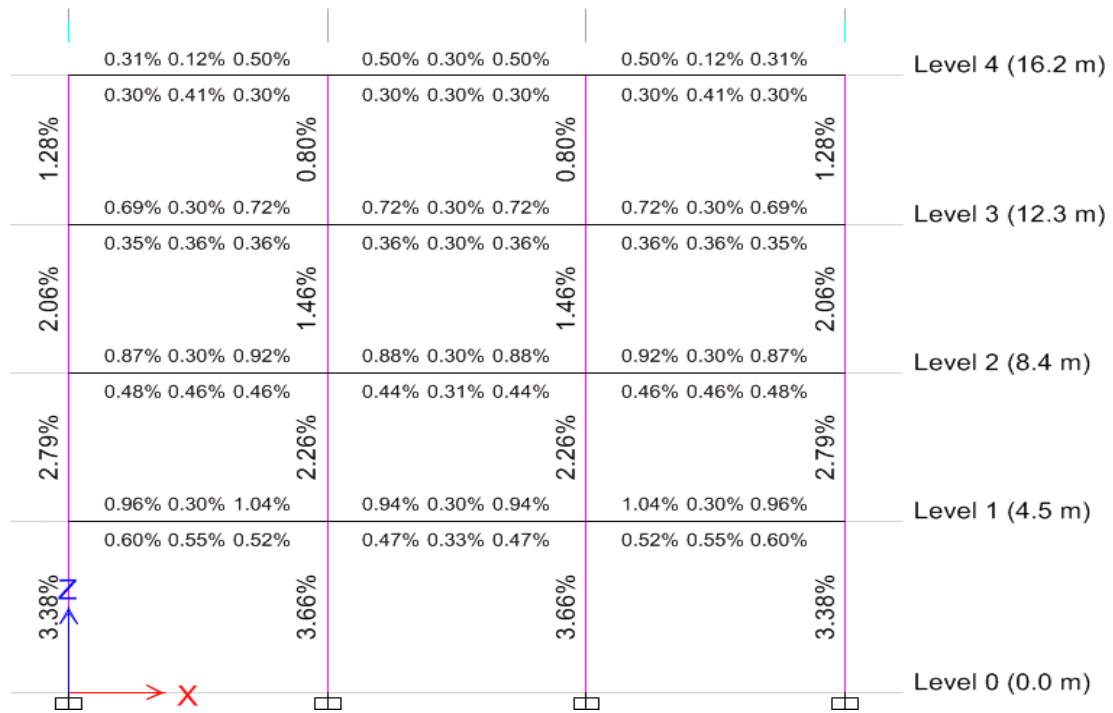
Required longitudinal reinforcement for building ID 2231
